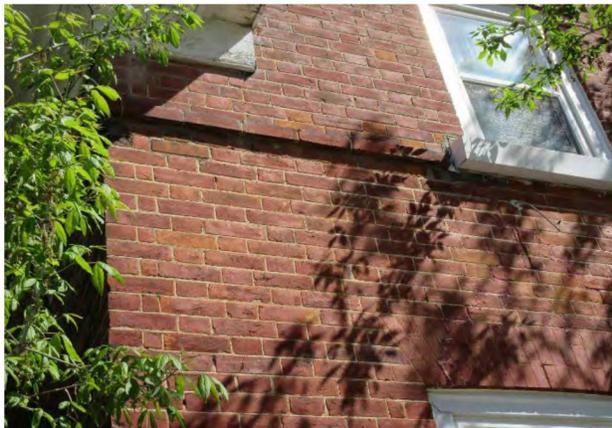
Masonry laid in Flemish bond and brick string course aligning with underside of 2nd floor window sills
